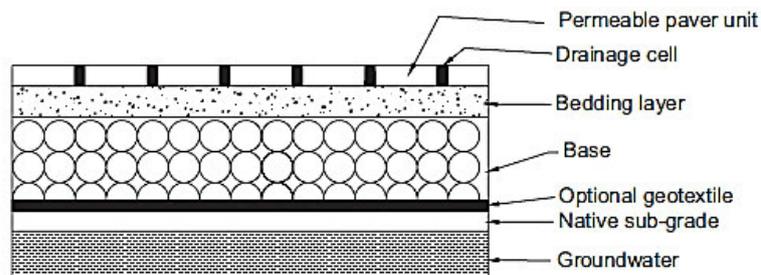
1: Permeable pavement system (Scholz and Grabowiecki, 2006).
